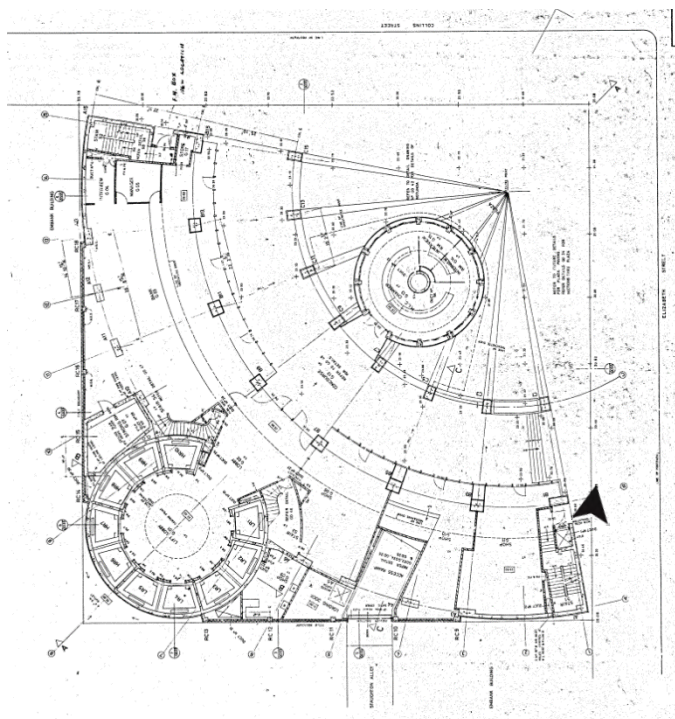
Ground floor plan, drawing dated 1969 (BAP).
